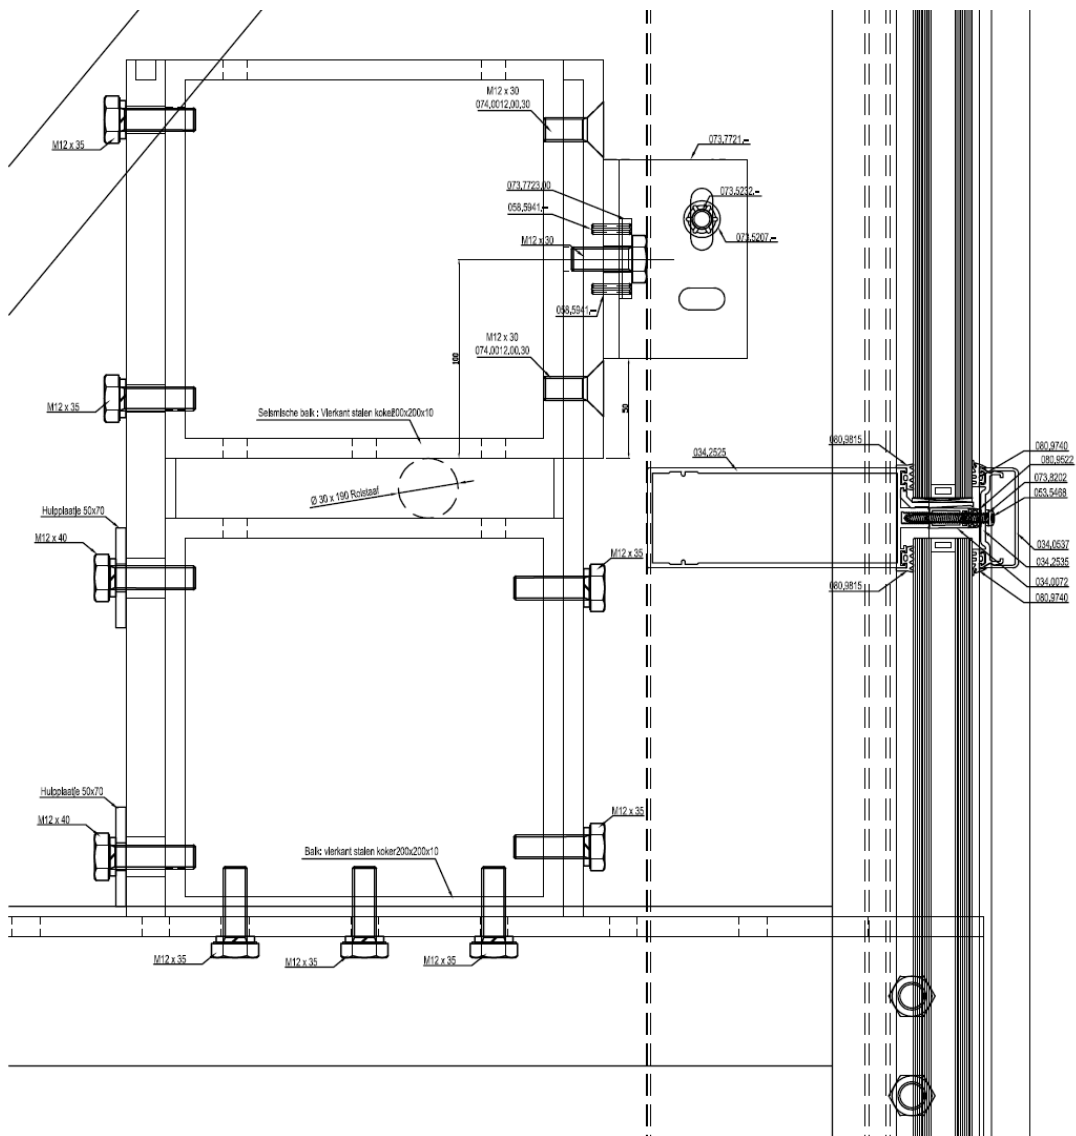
middle anchorage to the steel structure (loose anchor)
